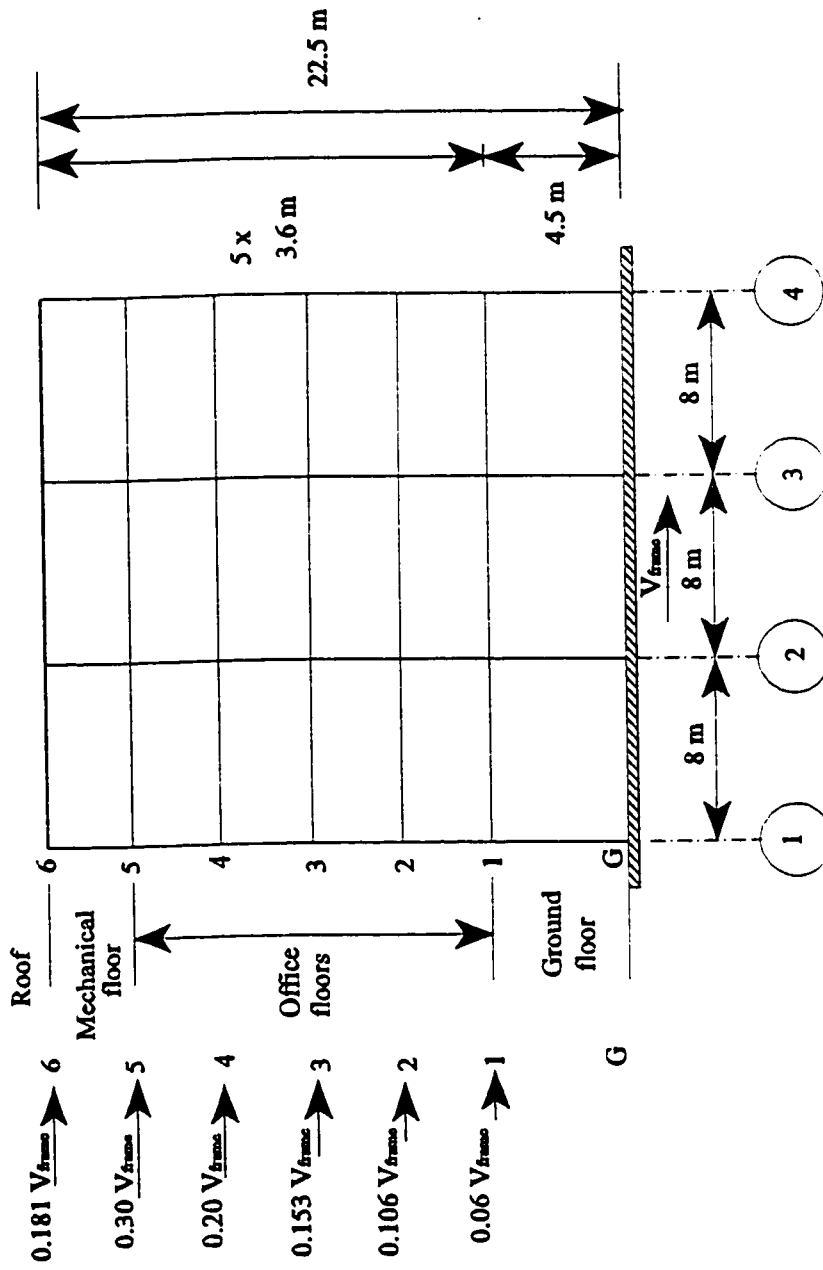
Elevation of the six storey moment resisting steel frame (column line A).
